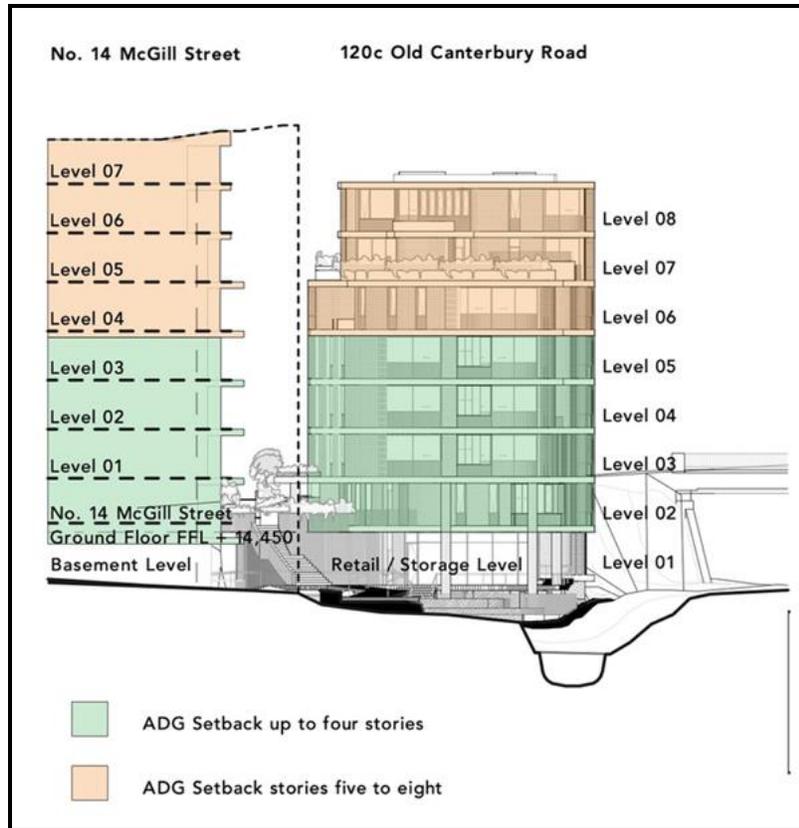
Blanket Diagrams illustrating floor levels ADG building separation requirements
